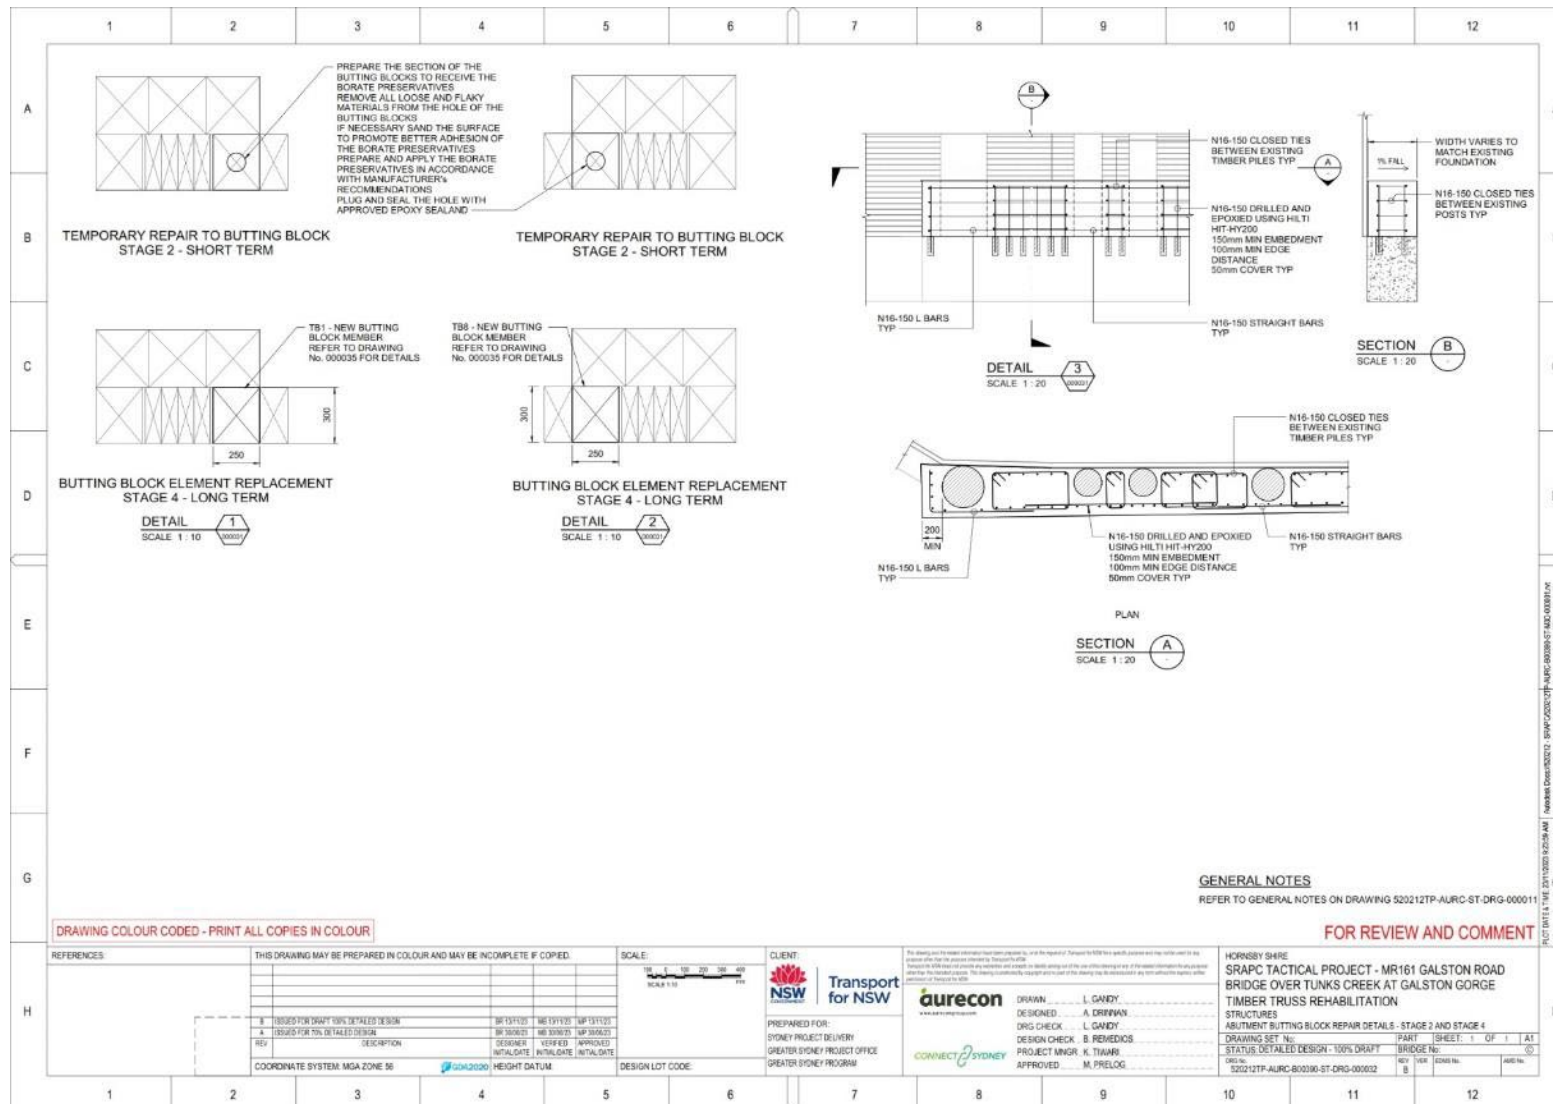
Structures abutment butting block repair details – Stage 2 and Stage 4: 520212TP-AURC-B00390-ST-DRG-000032 (Source: Aurecon)
